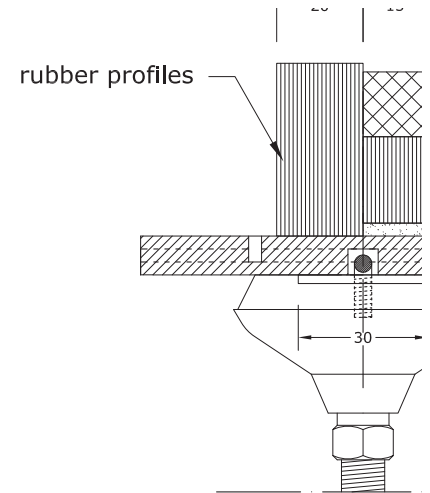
detail of the rubber edge profiles positioned on the formwork
